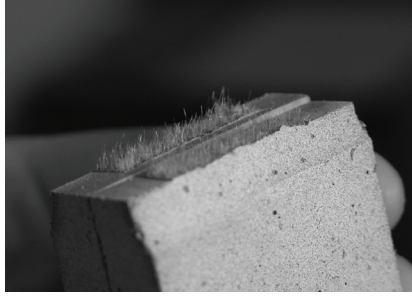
Single crack obtained with specimen used for the image analysis of cracking.
